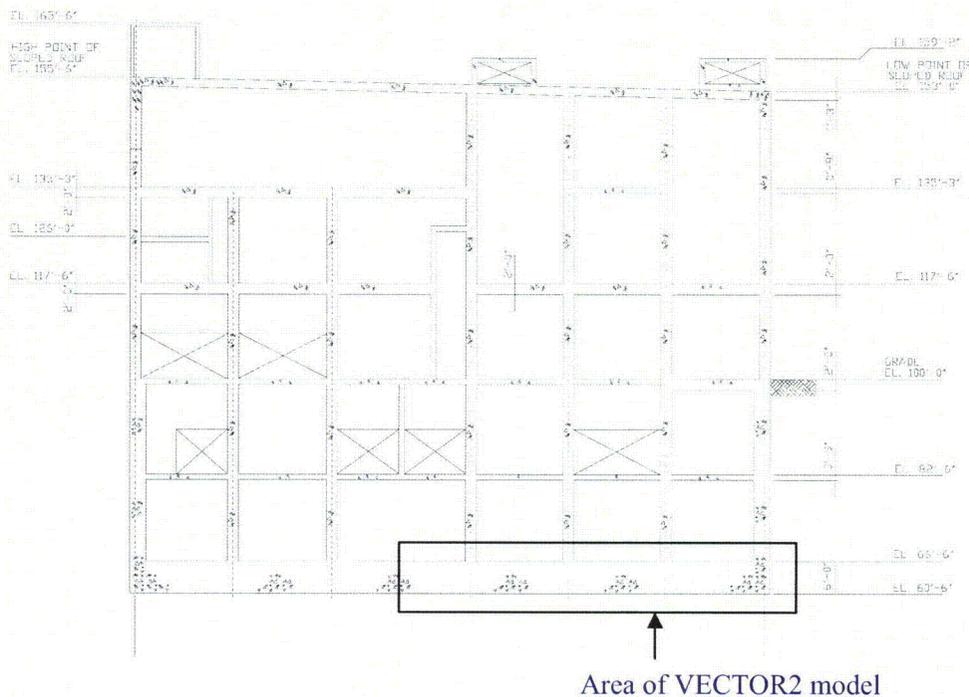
Cross section through north end of auxiliary building looking south
